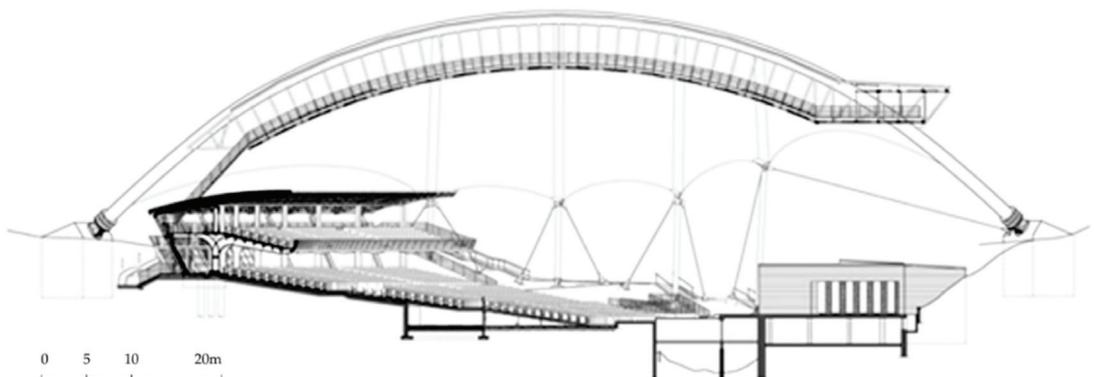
The scale of the main foundations of the load-bearing arch structure Forest Opera House in Sopot cross-section. <https://inzynierbudownictwa.pl/stalowa-konstrukcja-z-motyylim-dachem/10.05.2021> (accessed on 16 July 2021).
